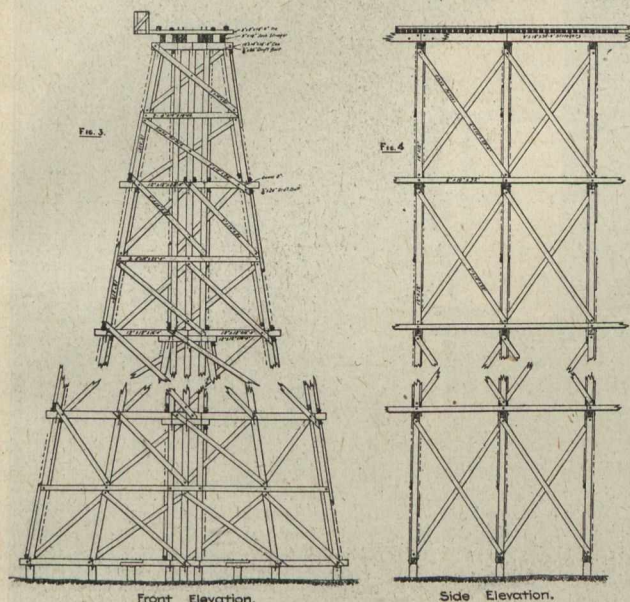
represents a general plan of a wooden trestle as generally built. This style has a batter of two inches to the foot (one in six). It has intermediate cap sills and sill. Notwithstanding that this plan is faulty in many details, it has the approval of two great corporations in Canada. It has not
